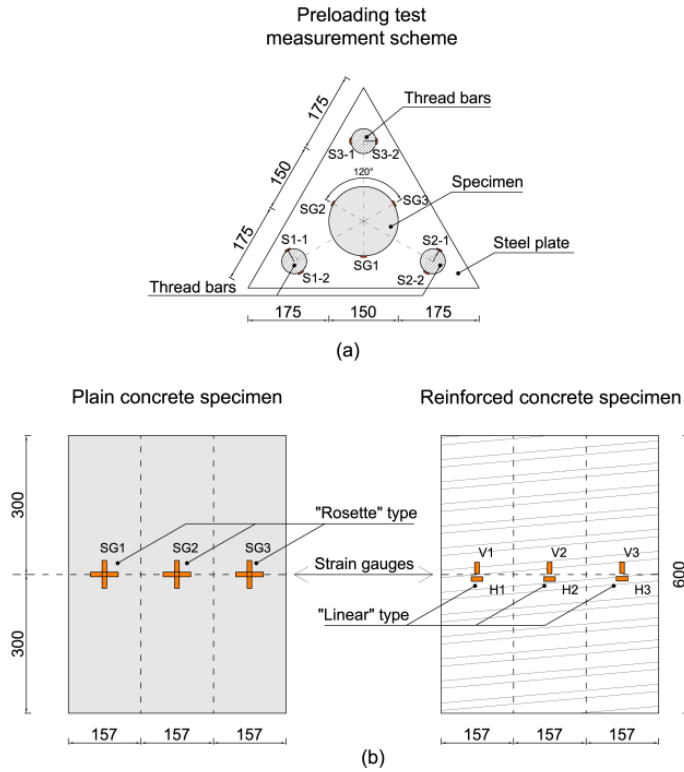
Strain gauges layout: preloading test measurement scheme (a), strain gauges arrangement on the specimens in developed view (b).
